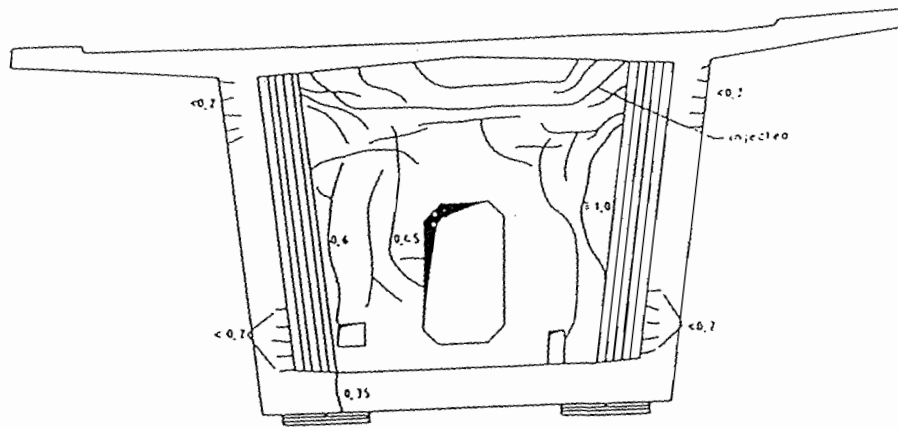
Cracks and their width (mm) in the box girder and in the diaphragm
